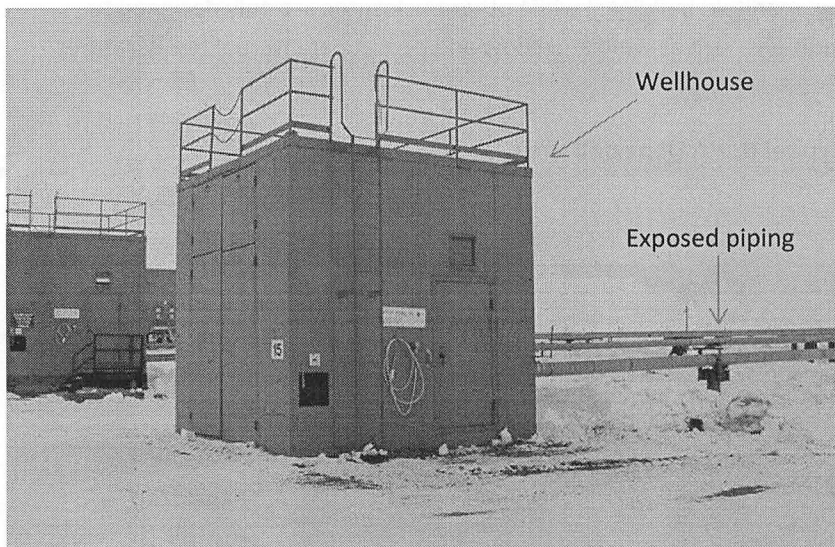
shows an example of a North Slope drill site wellhead and an exposed piping manifold collecting material from the drill site wellheads. The wellhead is housed in a building to shield the equipment from the environment.
